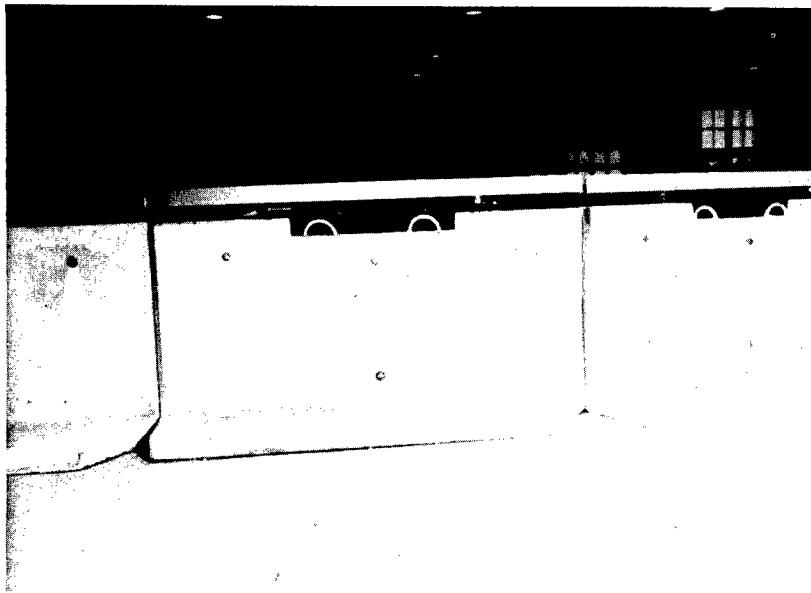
The above photo. shows a typical concrete "T" section used to form the outer basin walls of the flume. These portable sections are sealed together and to the floor to form a watertight basin of any desired size and shape.
